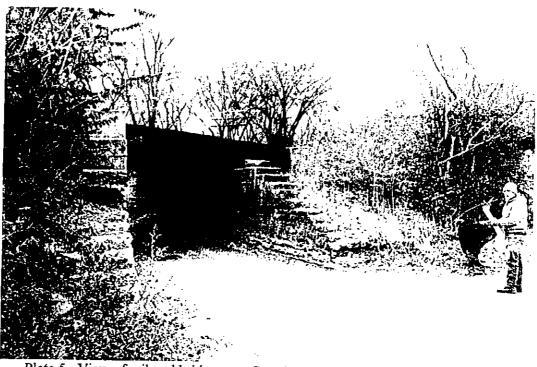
View of railroad bridge over Corwin Road along Proposed Route, facing southeast.
